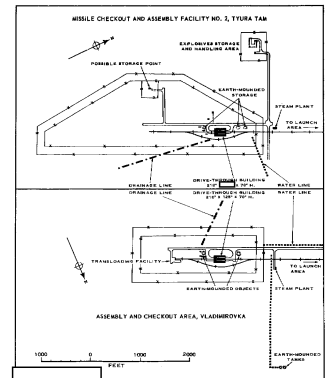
COMPARISON OF THE ASSEMBLY AND CHECKOUT AREA AT COMPLEX "D" WITH MISSILE CHECKOUT AND ASSEMBLY FACILITY NO. 2. AT TYURA TAM.
